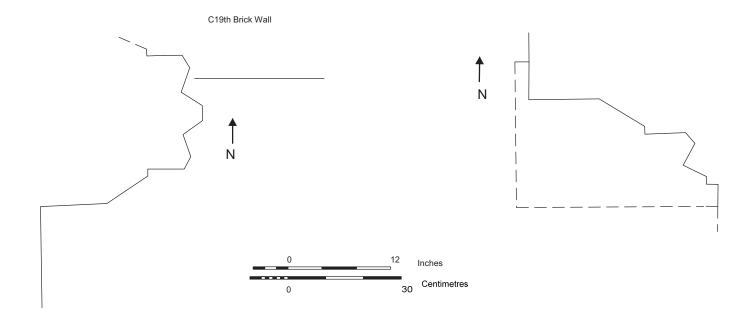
Detail of vault profiles X and Y, located on Ground Floor Plan, Figure 1. Print Scale 1:10
